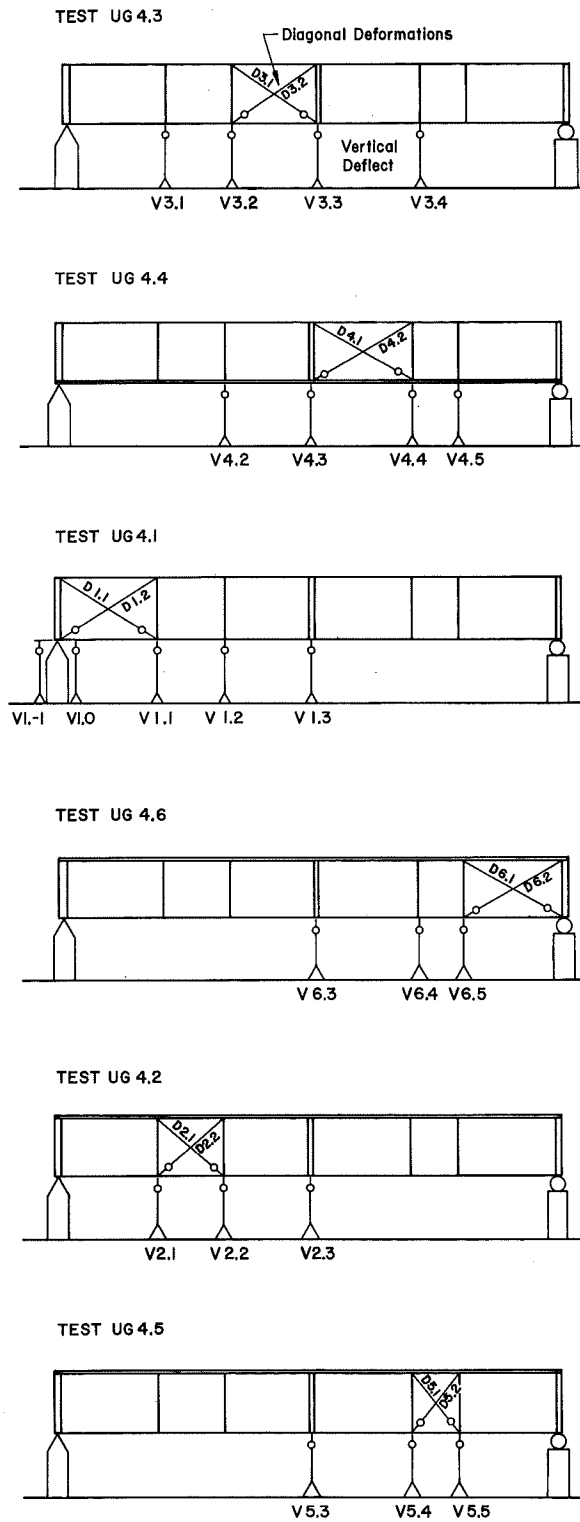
Dial Gage Instrumentation For Girders UG4 and UG5
